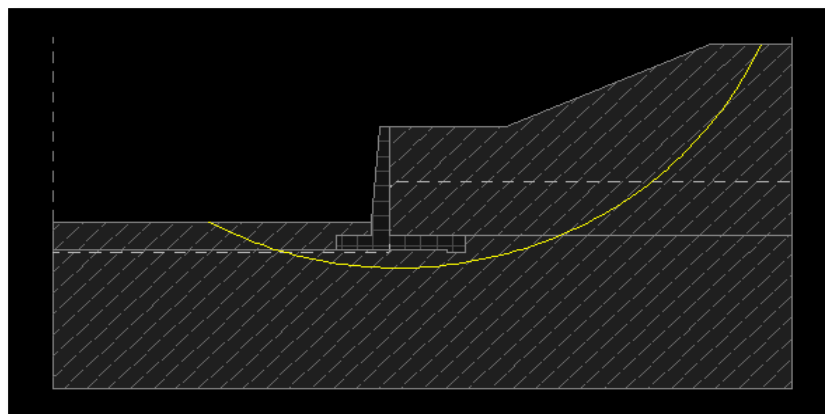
Slope stability of the cantilever wall (Geo 5)
